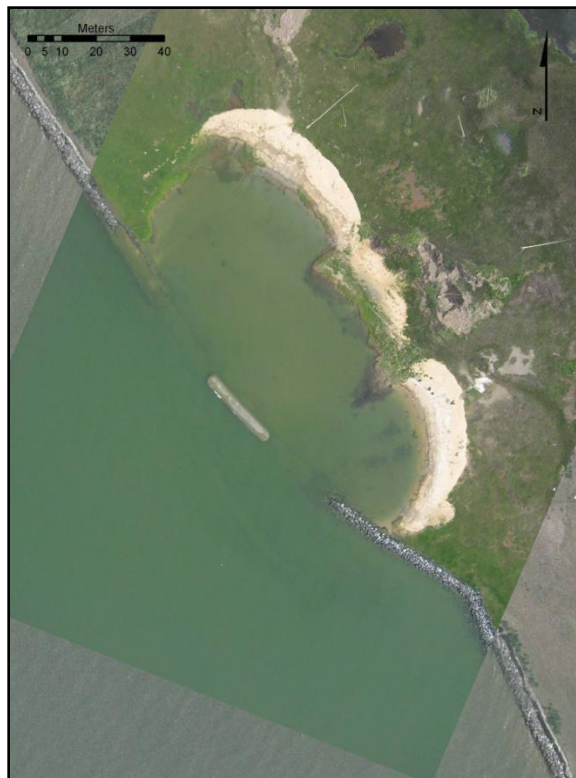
Dredged material eroded from the placement site after the geotextile tubes failed, western side of Barren Island (photo August 2008).
